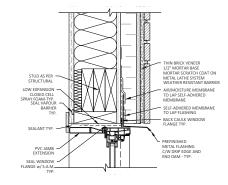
TYPICALWINDOW HEADER DETAIL WITH MASONRY WORK
